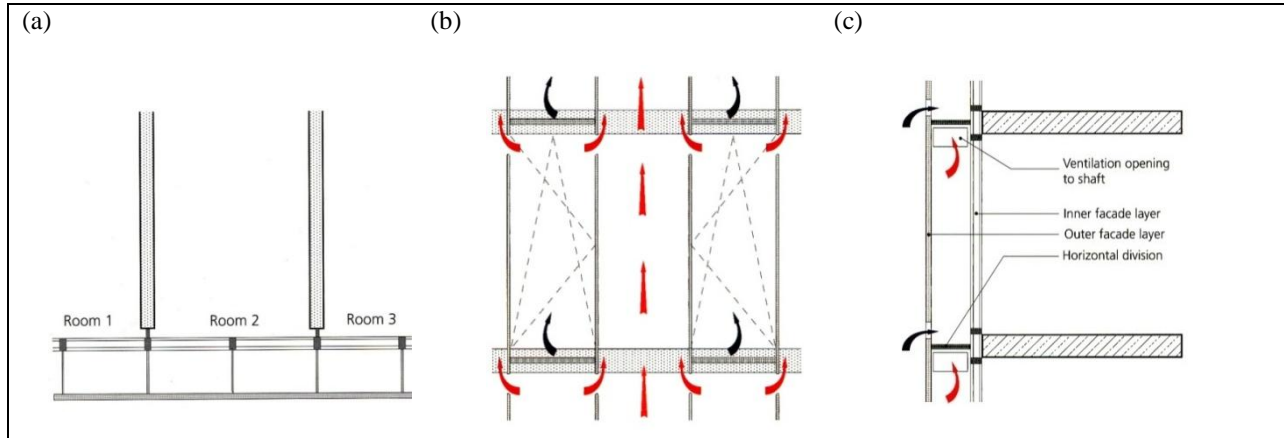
Shaft box facade: Plan (a), section (b) and elevation(c) (Osterle, 2001)
